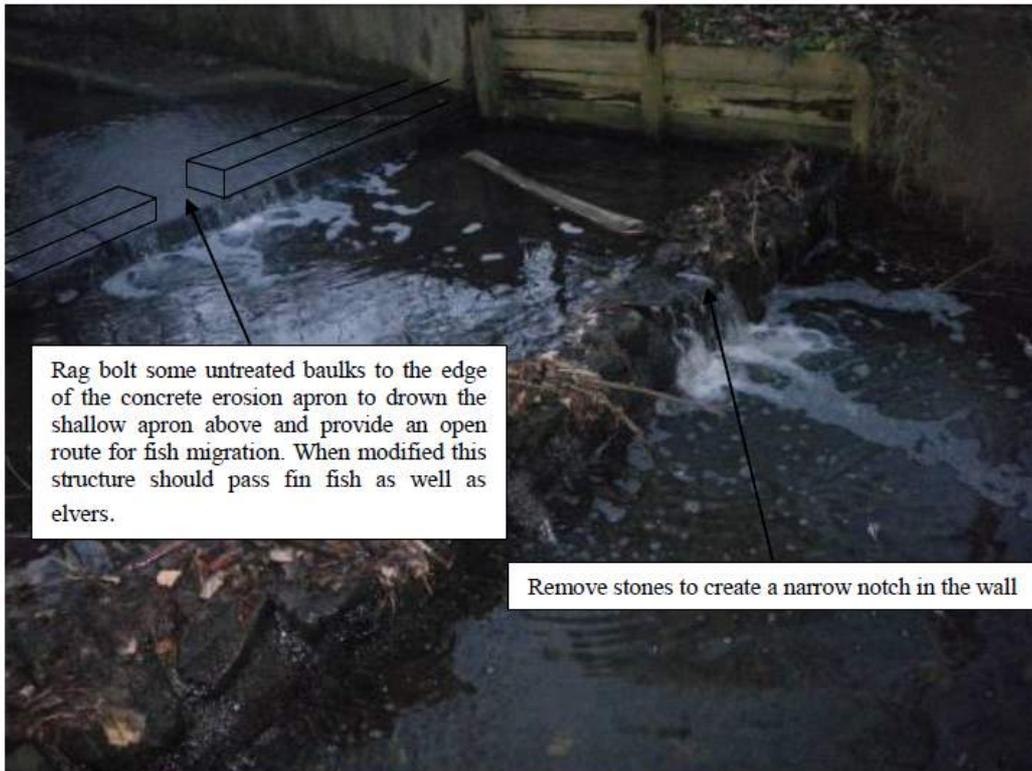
Recommendation for barrier easement provided by the Wild Trout Trust
